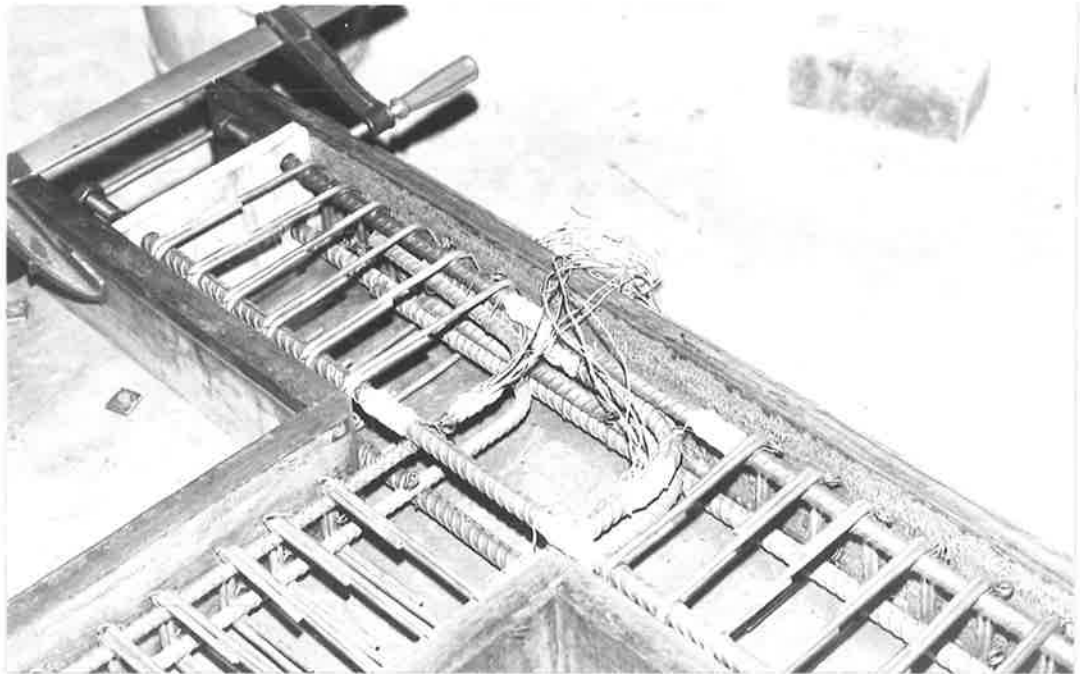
A close up view of the reinforcement prior to pouring the concrete. The water proofed gauges used only in specimens 8 and 9 can be seen attached to the steel in the joint block zone.
